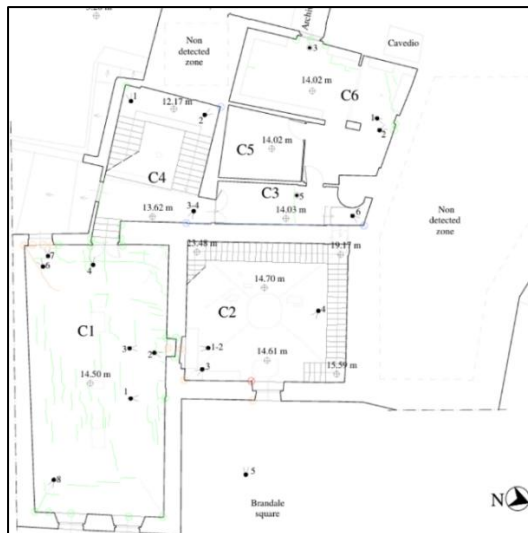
Plan of the Second Floor – Crack Pattern of Vertical Elements
